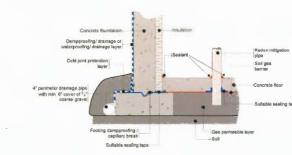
Sealing sub-slab membrane horizontally to concrete footing when insulation is between the foundation wall and floor slab
